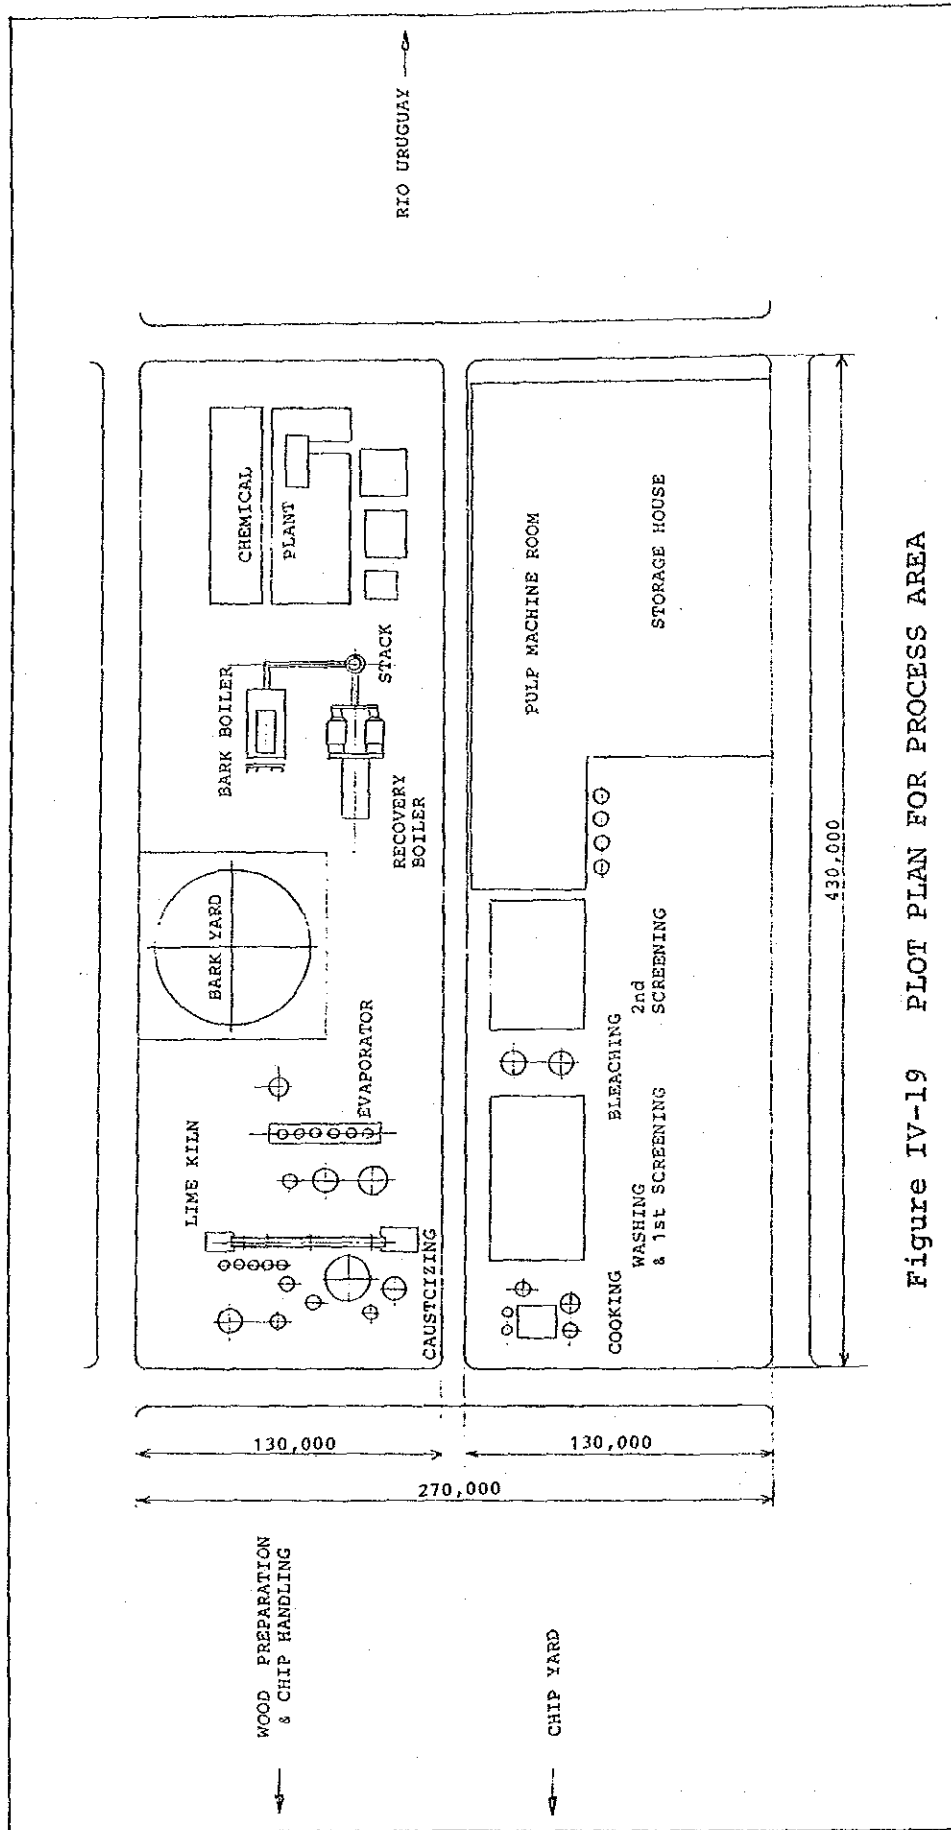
PLOT PLAN FOR PROCESS AREA
